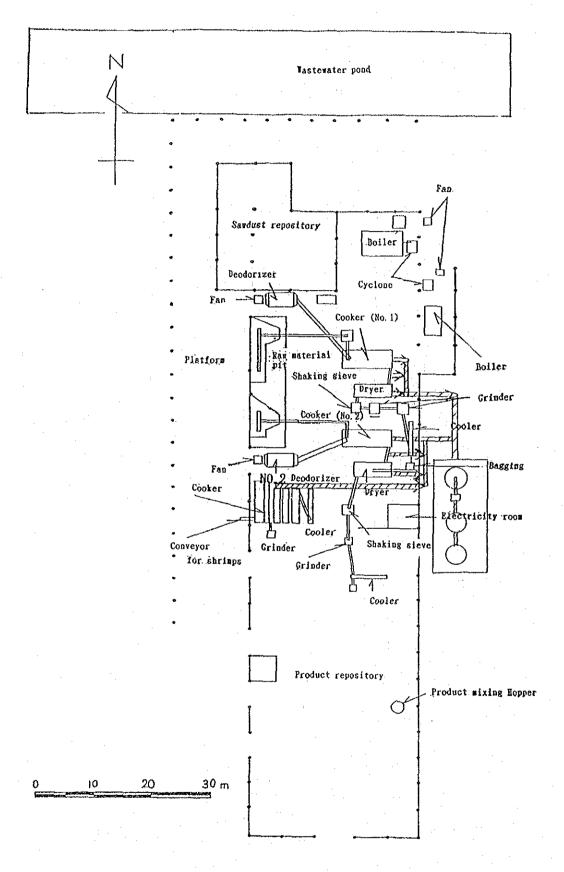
Layout in the Factory (Fish Meal Plant B)
